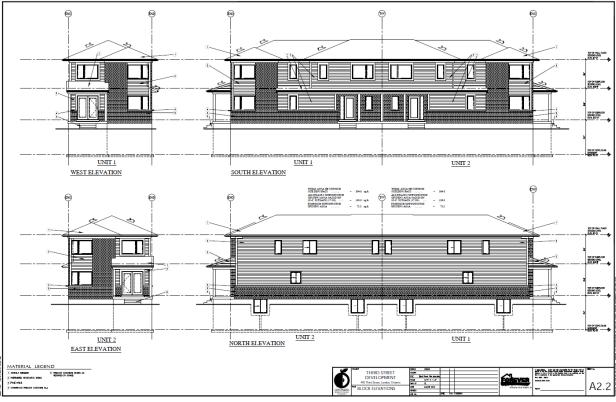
Proposed 1 2 unit building Elevation – submitted by applicant
